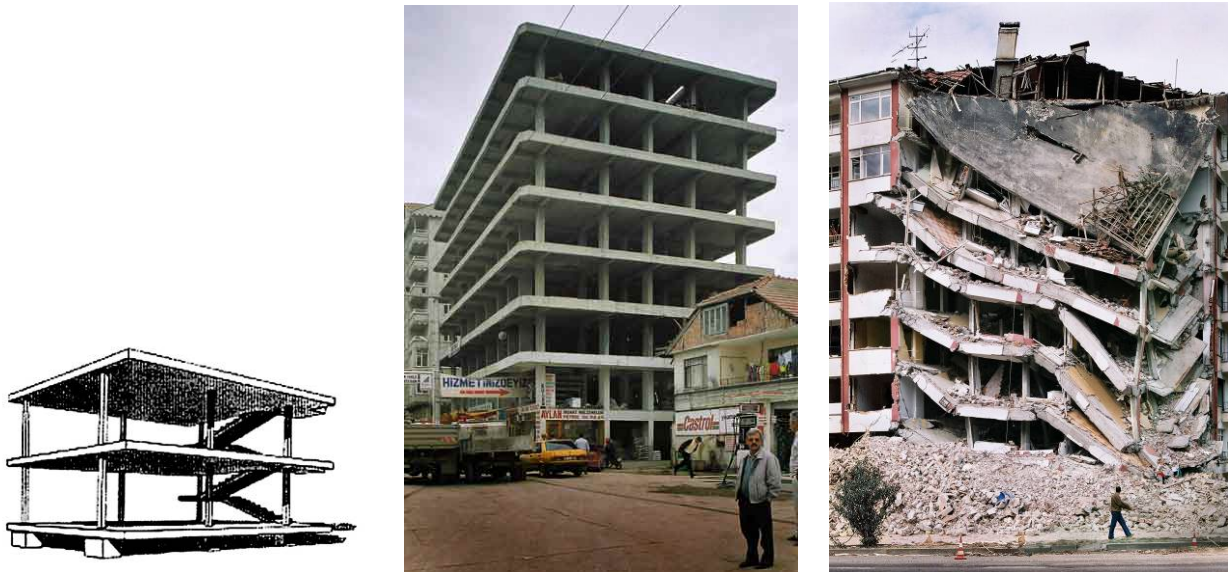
left: Dom-ino House by Le Corbusier, 1915. middle: Building under construction in Gölcük, Turkey shown after the 1999 earthquake. Because the masonry infill walls had not yet been installed, frame action was able to occur, and thus the building was not collapsed by the earthquake. right: Building in Gölcük close to the one shown in Fig. 17 collapsed by 1999 earthquake. The heavy masonry infill walls together with open (soft) ground floors were often contributors to such collapses.
